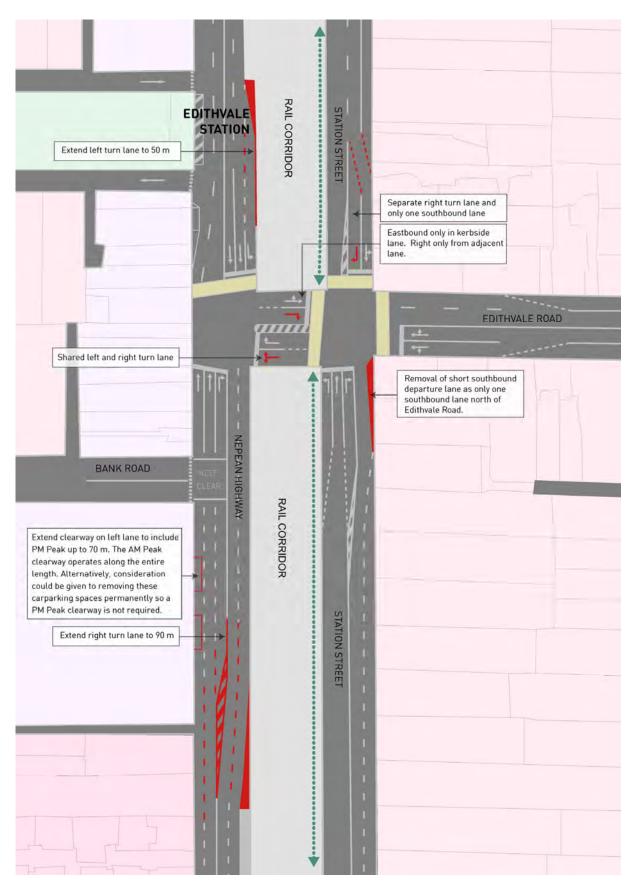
Nepean Highway, Station Street and Edithvale Road intersections proposed layout
